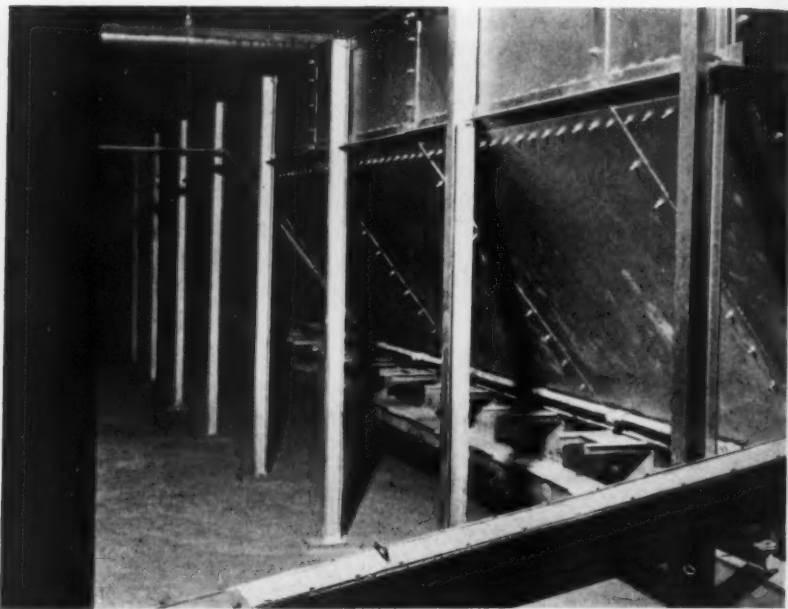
Fifty-ton Soda Ash Bunker, with 6-inch screw conveyor to supply chemical feed machine
